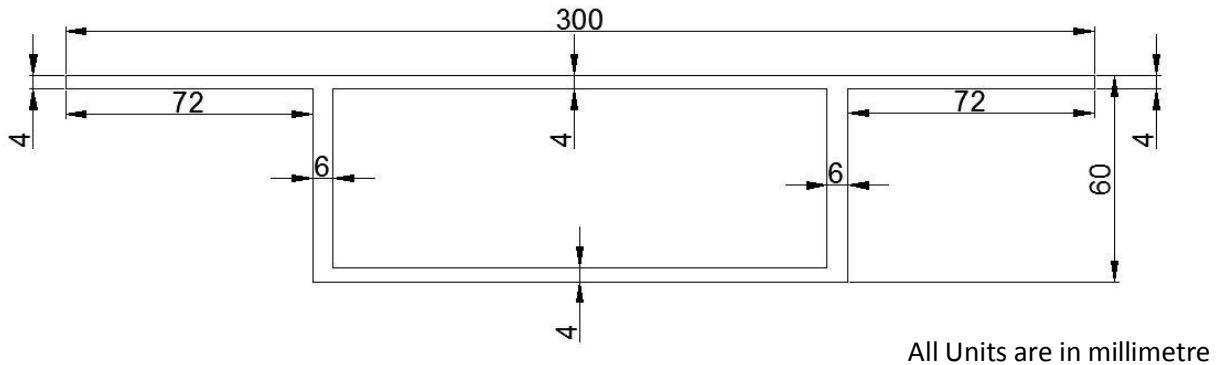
Cross Section of Simply Supported Box Girder Bridge
